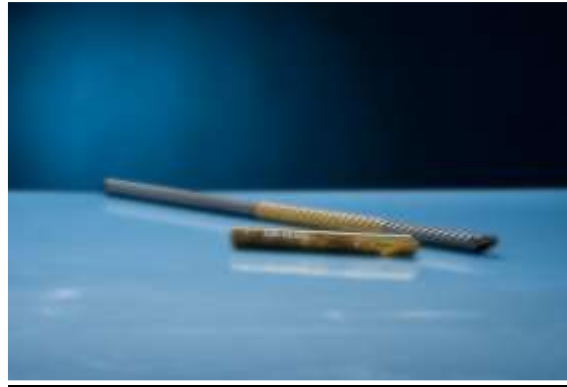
Anchor including cartridge with special adhesive - adhesive anchor (Hrapović 1.; 2020, S. 132)
